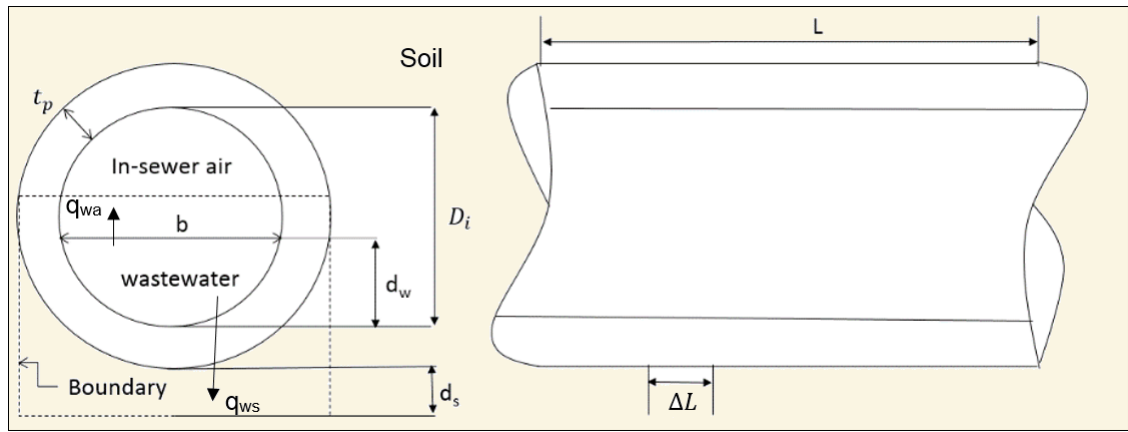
Cross and longitudinal sections of a sewer pipe.
